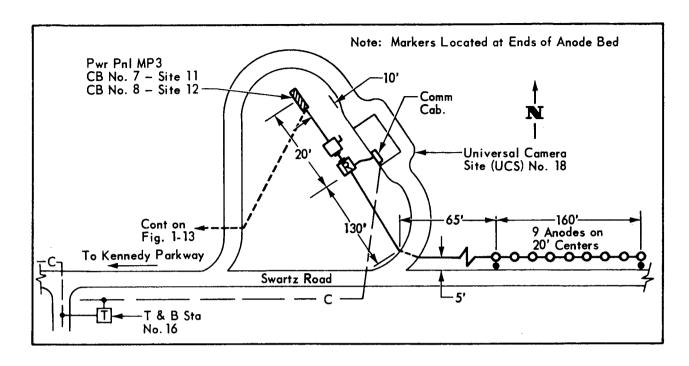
Site No. 11 and Test and Bond Station No. 16
